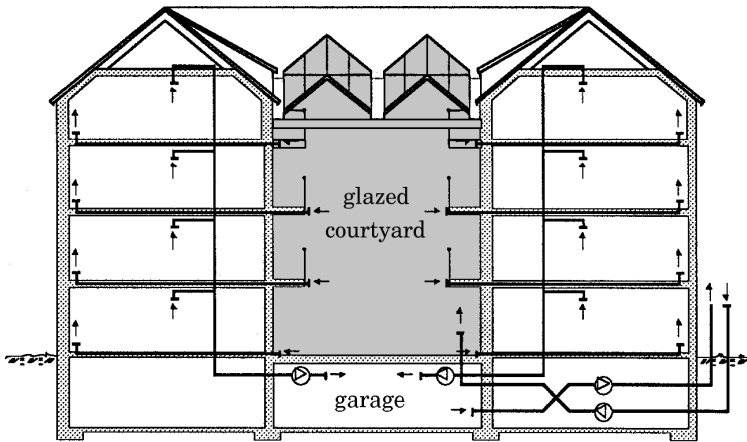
Section showing the ventilation system, Piggvaren (Blomsterberg, 1993).
